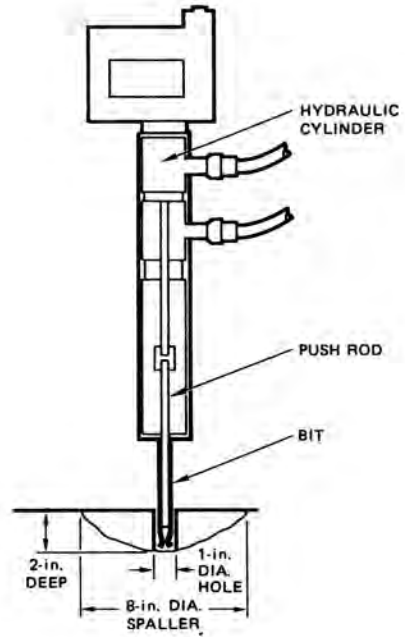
Concrete Spaller with Hydraulic Cylinder.
